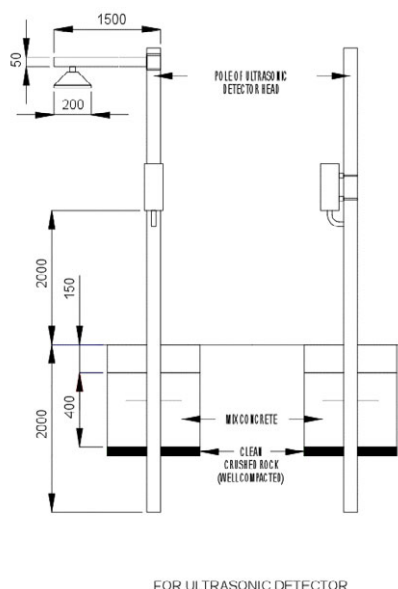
Standard Installation Plan for Detector and Cabinet
